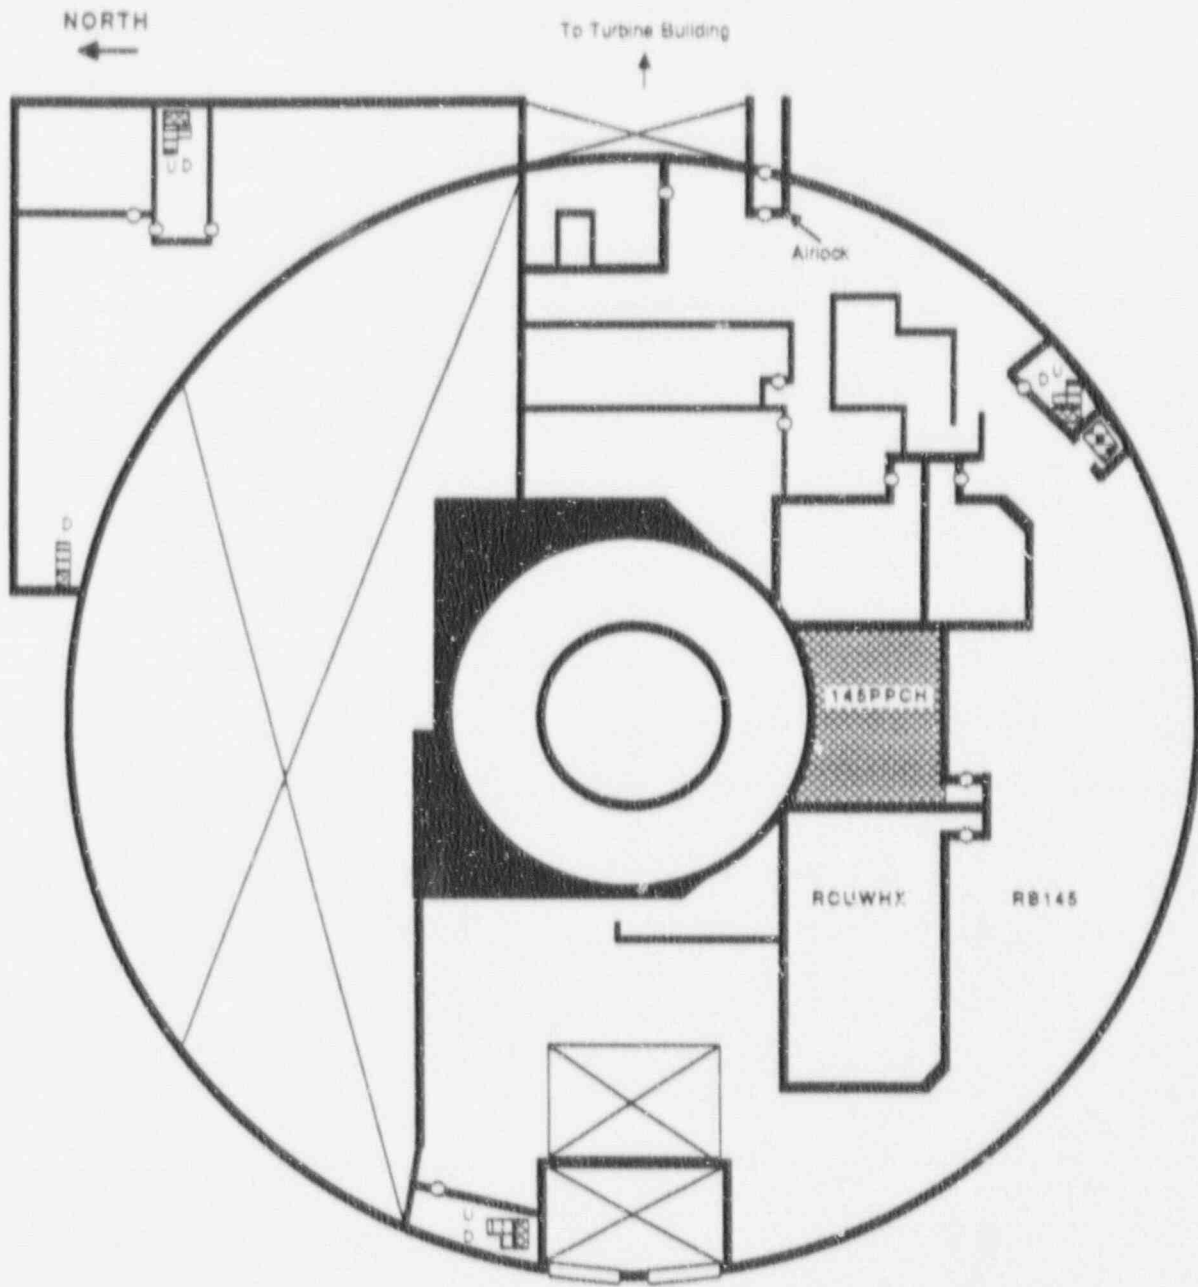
Hope Creek Reactor Building Elevation 145'-0"
